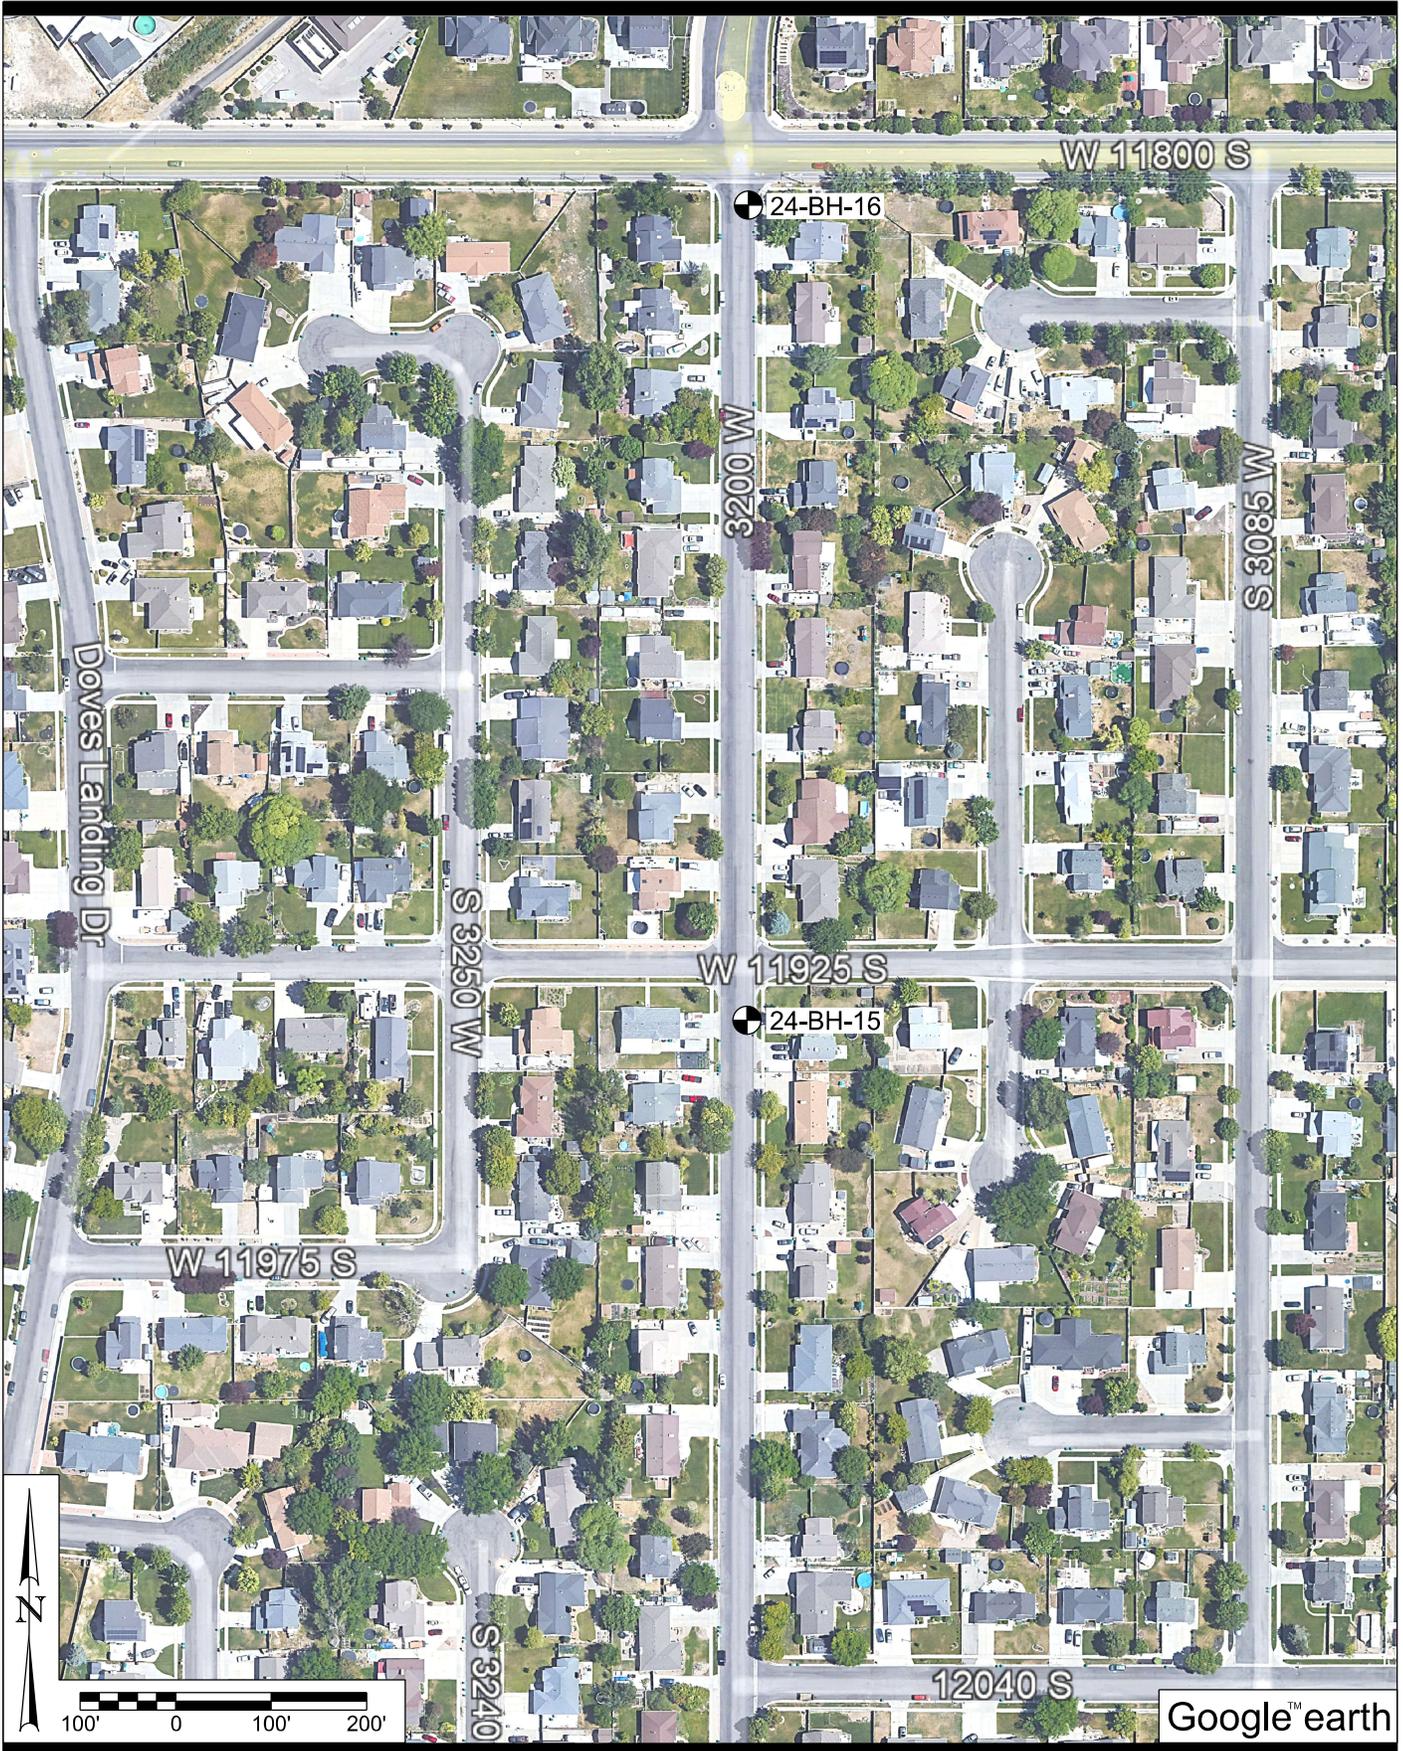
SITE PLAN & TEST HOLE LOCATIONS
